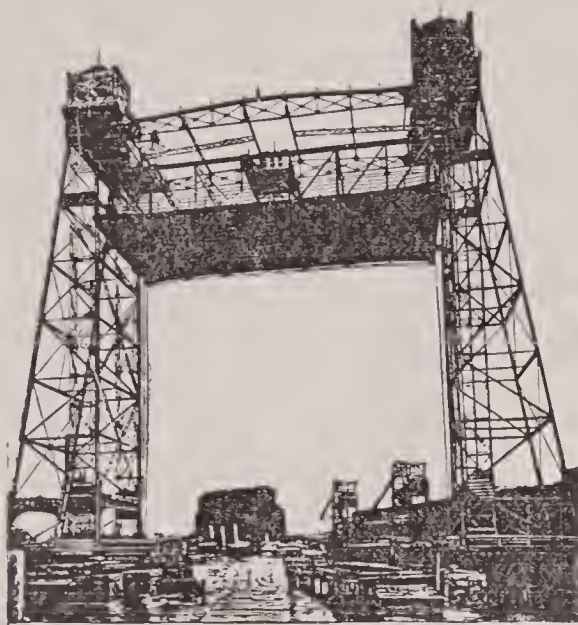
LIFT BRIDGE, SOUTH HALSTED ST., CHICAGO.
